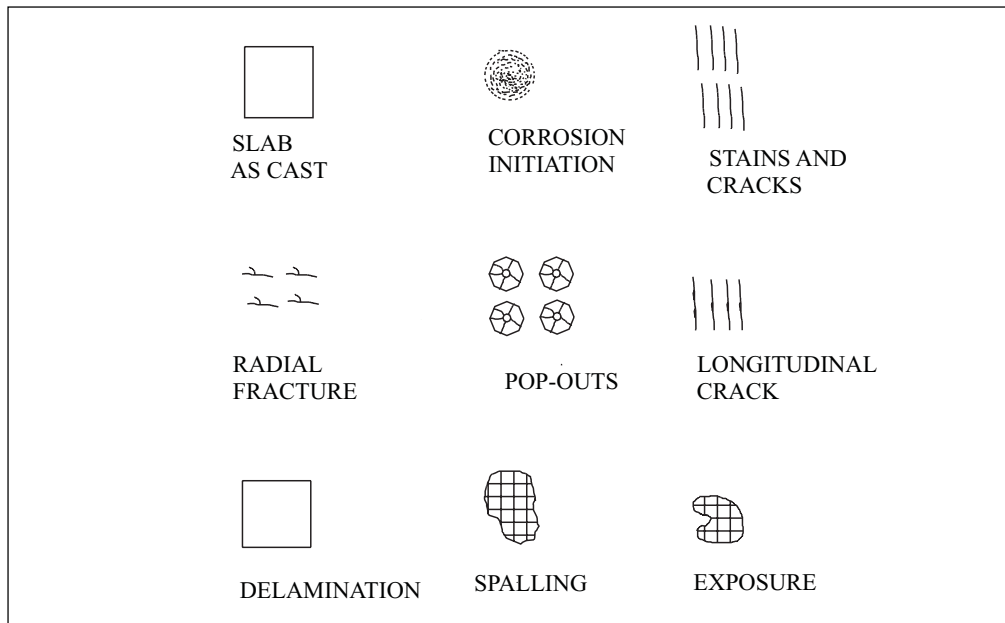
Typical symptom of corrosion in a reinforced concrete slab
